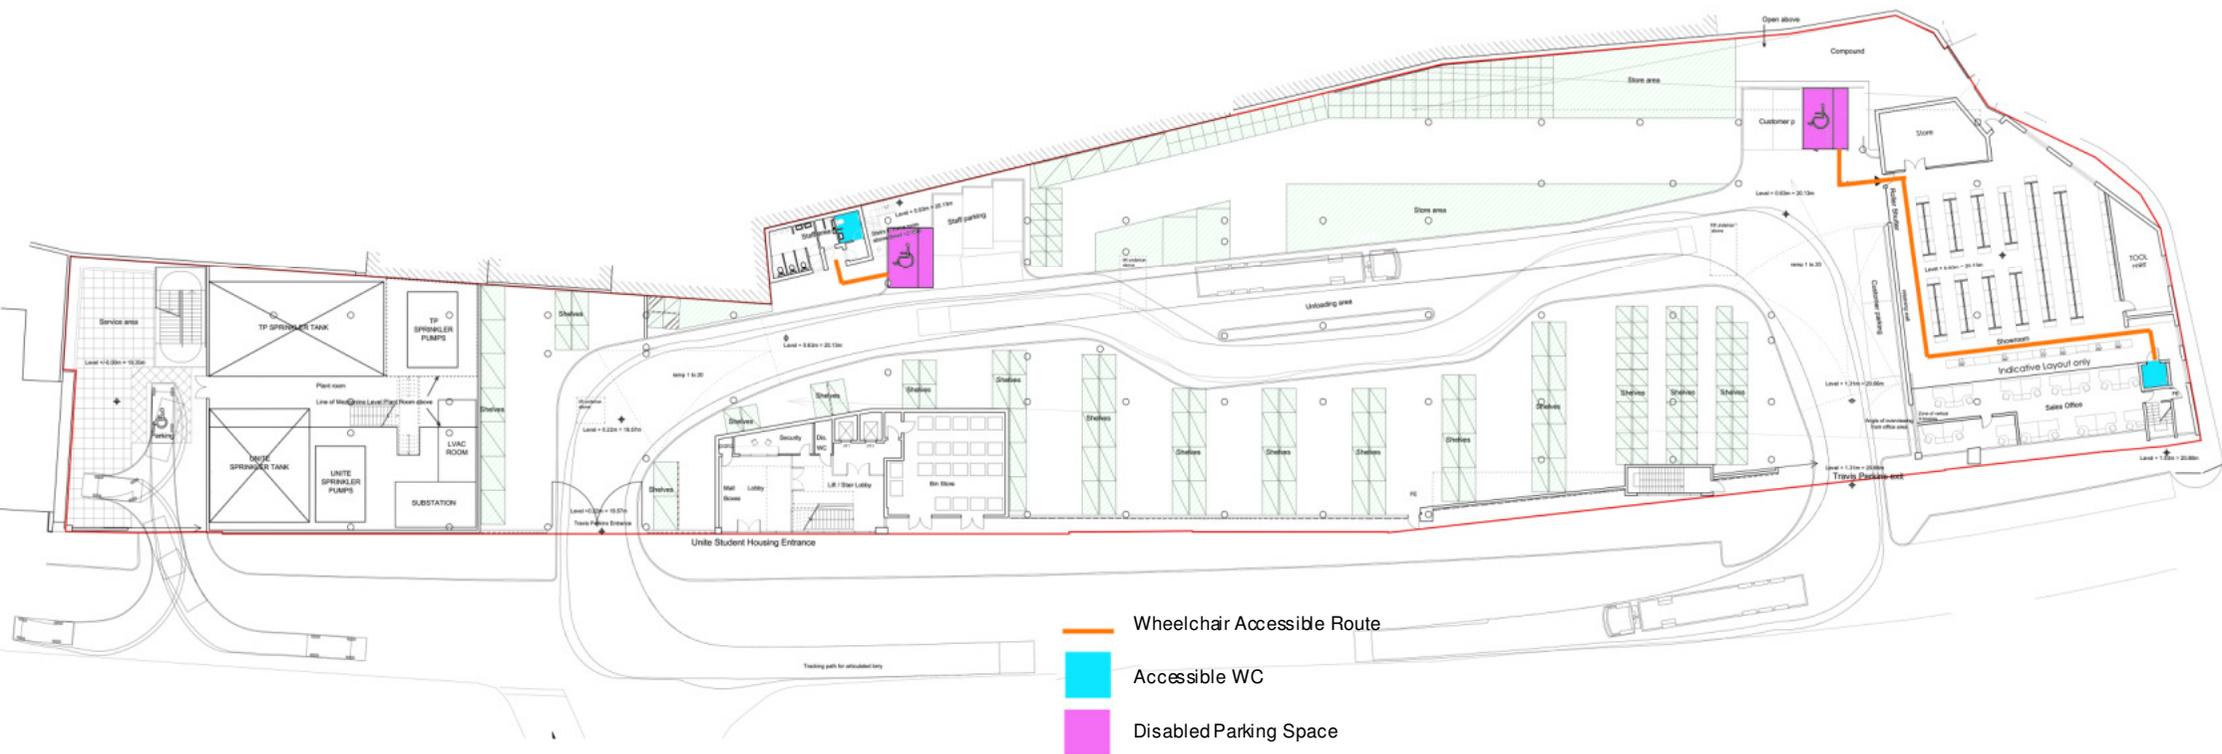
Access Diagram - Travis Perkins Facility
